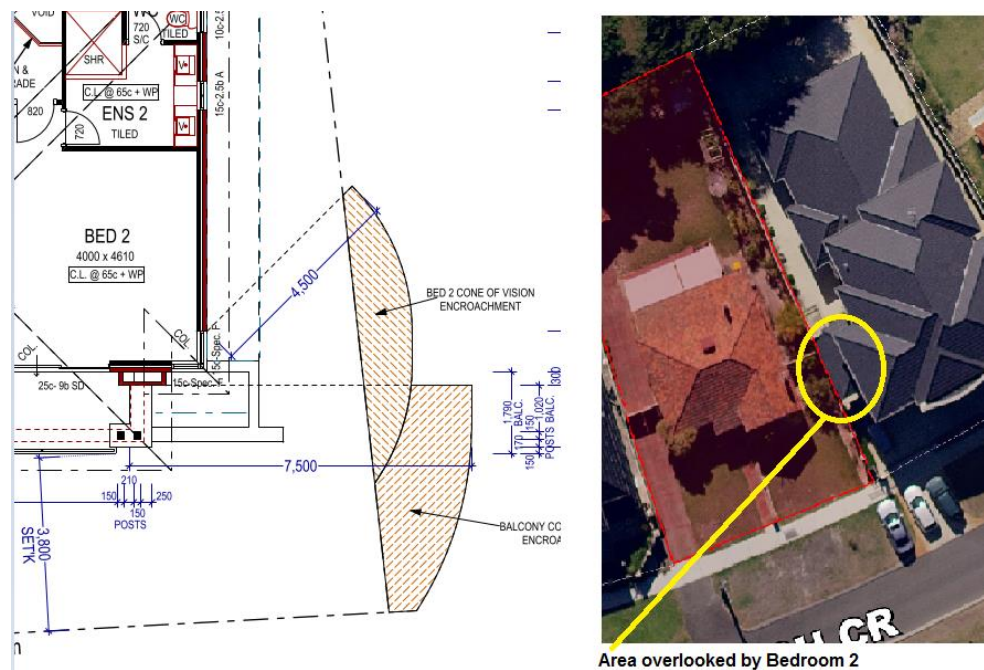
Diagram illustrating area to the south at No. 47 Ranelagh Crescent that would be overlooked by bedroom 2.
